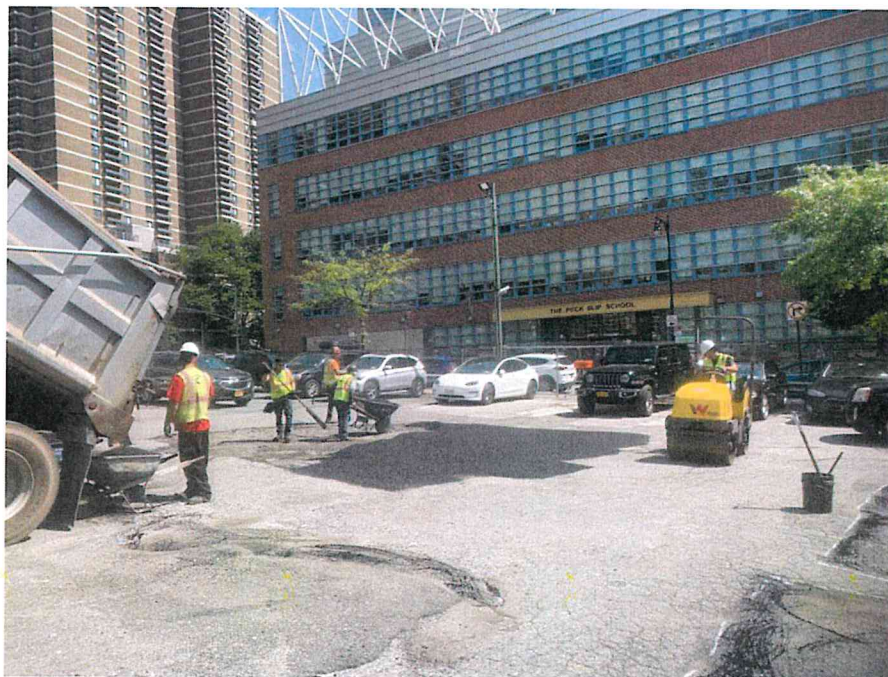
View of backfilling and compaction of a 1.5-inch asphalt layer (facing project northeast)
